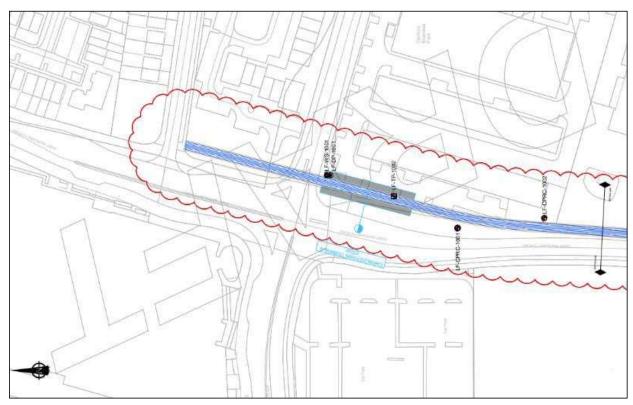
GI Plan Sheet 12, Luas Finglas (Barry Transportation and Eegis).
